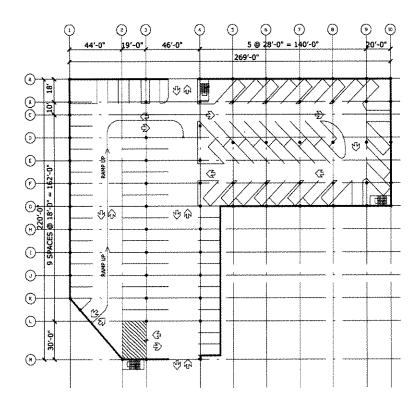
Conceptual Design for the Brann/Riley Site Mixed-Use Parking Structure - Site Plan
